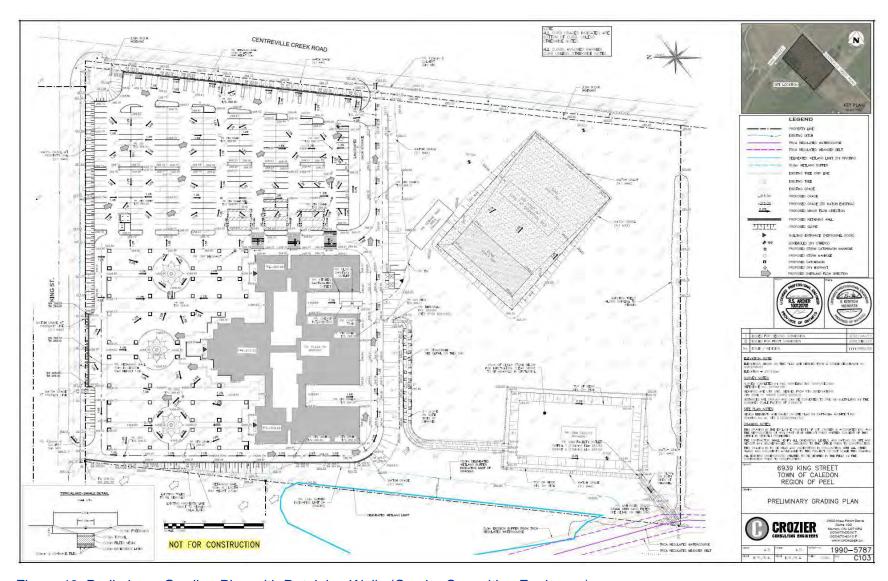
Preliminary Grading Plan with Retaining Walls (Crozier Consulting Engineers)
